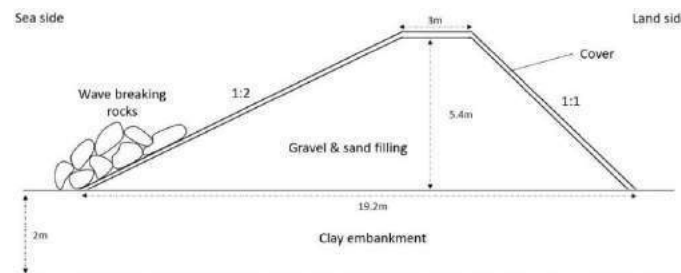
Cross section of the modelled dam protecting the Avedøre Holme area in Copenhagen.
